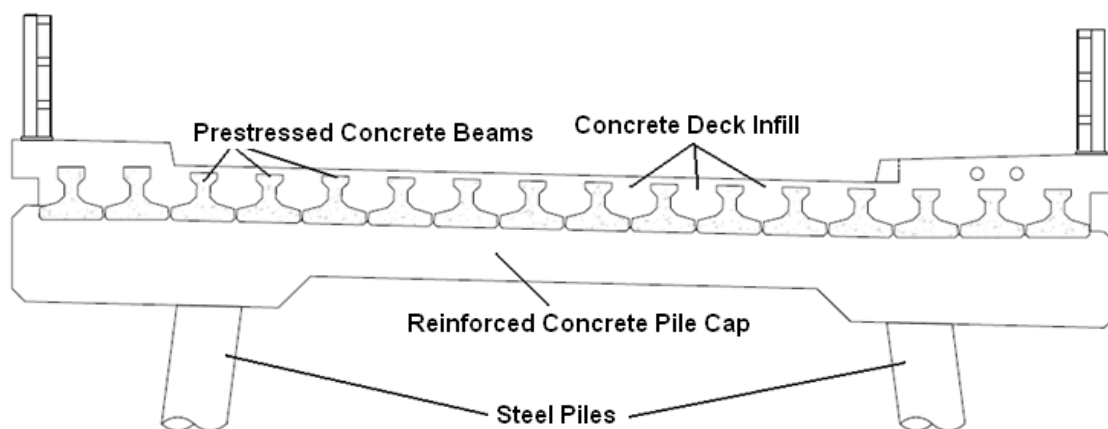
Typical structural cross section of the Kyle of Tongue bridge, UK.
